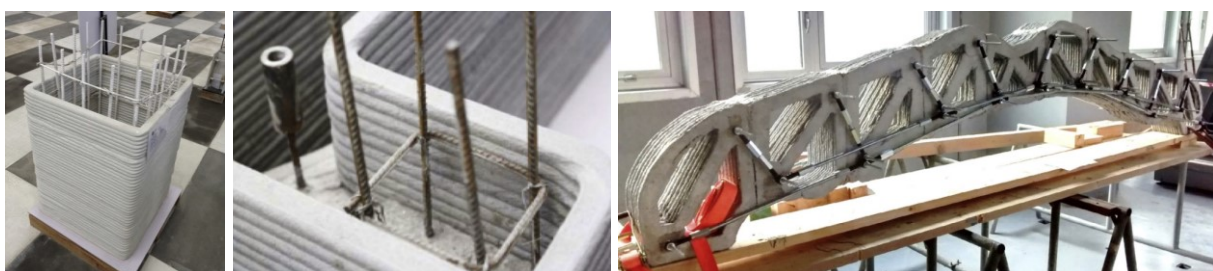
Left and middle: Concrete moulds by WinSun [30], [17]. Right: External reinforcement [31].
